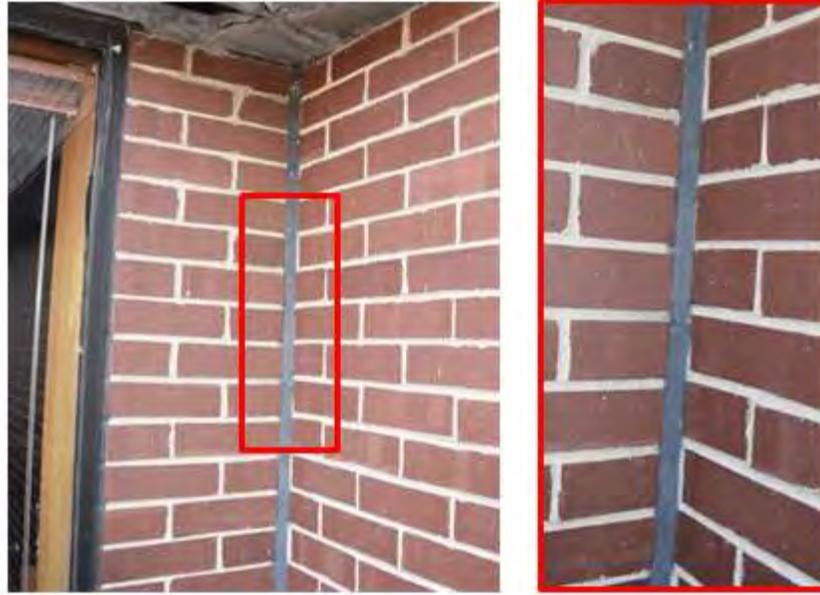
Joint sealant found on exterior of school containing 239000 parts per million PCBs
